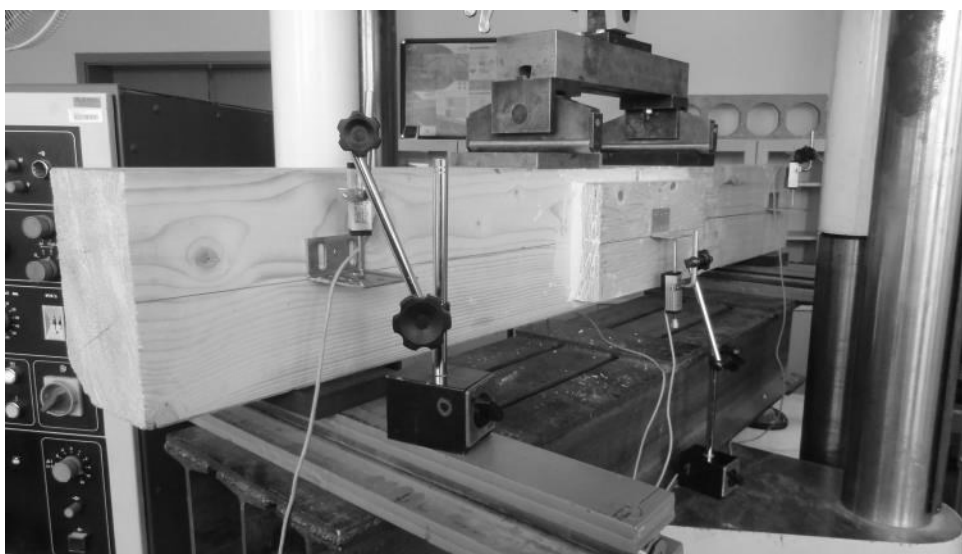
Timber beam with bonded joints and LVL plates in testing machine
